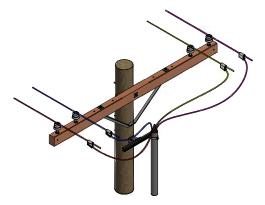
OPEN SECONDARY "AIR MAILING" ISOMETRIC VIEW
